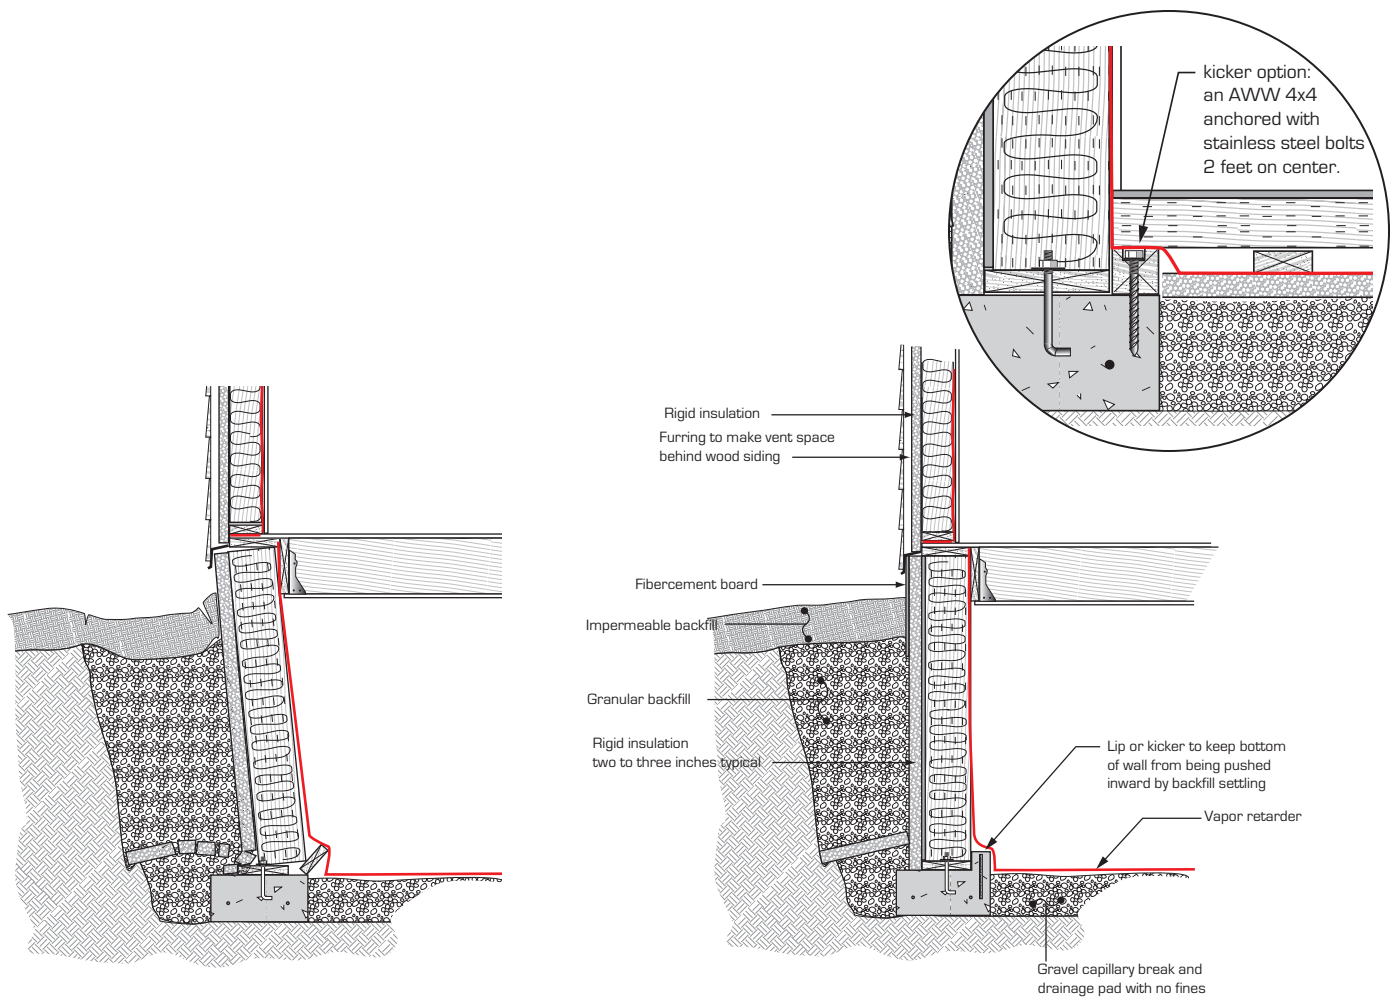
Foundation failure from backfill settling and how to prevent it using a kicker. Inset shows a kicker built after the footing is poured.
